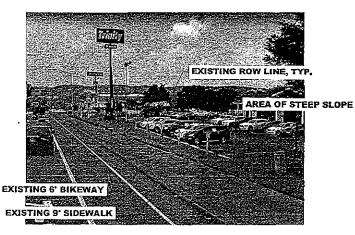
NORTH ALONG ROSA L PARKS BLVD
